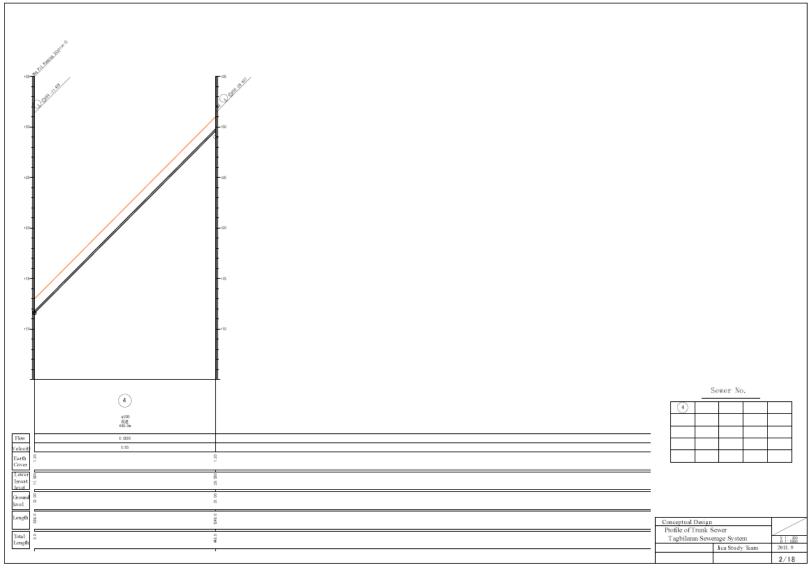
Profile of Trunk Sewer (Tagbilaran Sewerage System)
